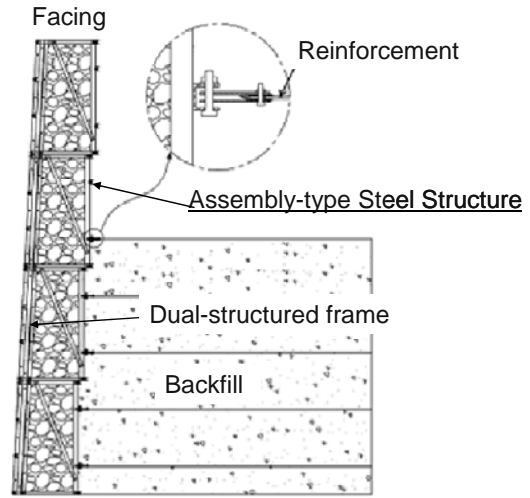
Construction schematics of SFREW including facing, connection between facing and reinforcement, backfill, and dual-structured facing
